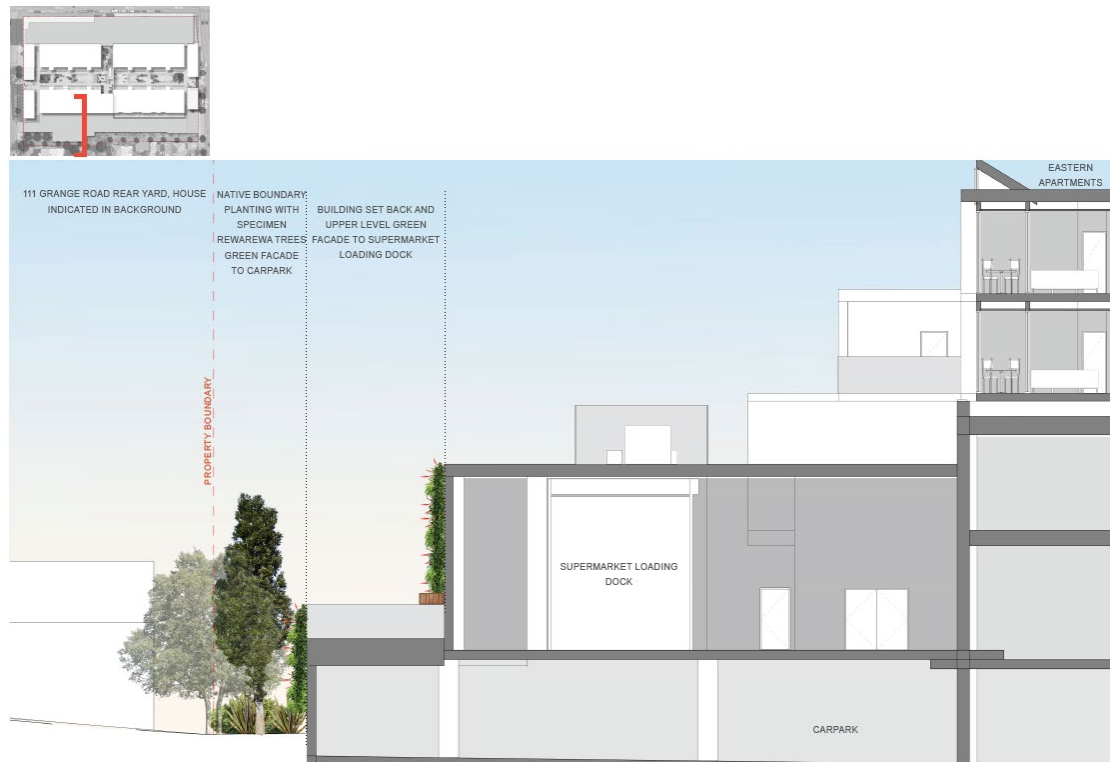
Cross section between rear yard of 111 Grange Road and proposed building
